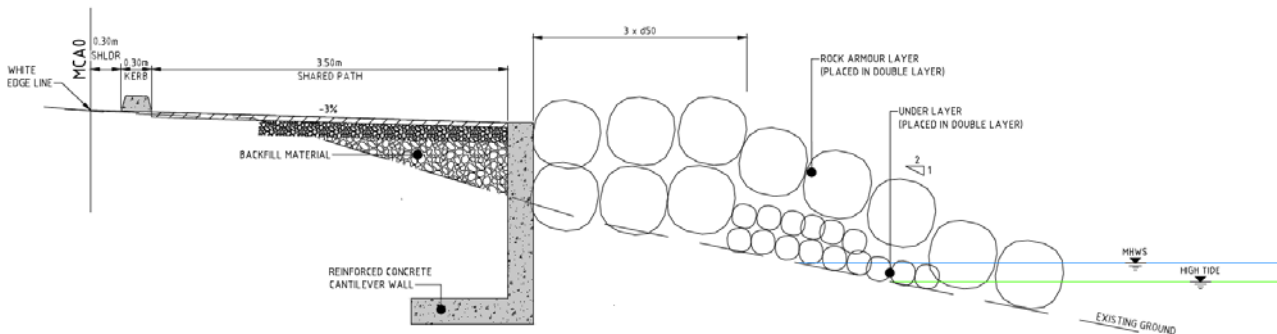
Typical Revetment with Reinforced Concrete Cantilever Wall
